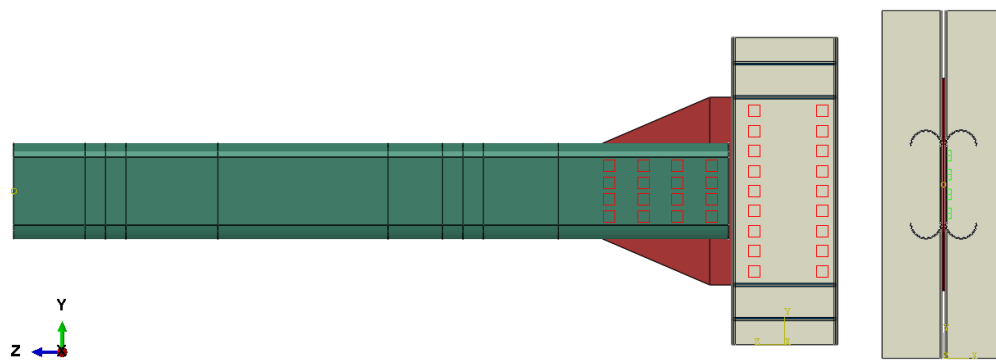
Side and front view of CFS Bolted beam-to-column connection
